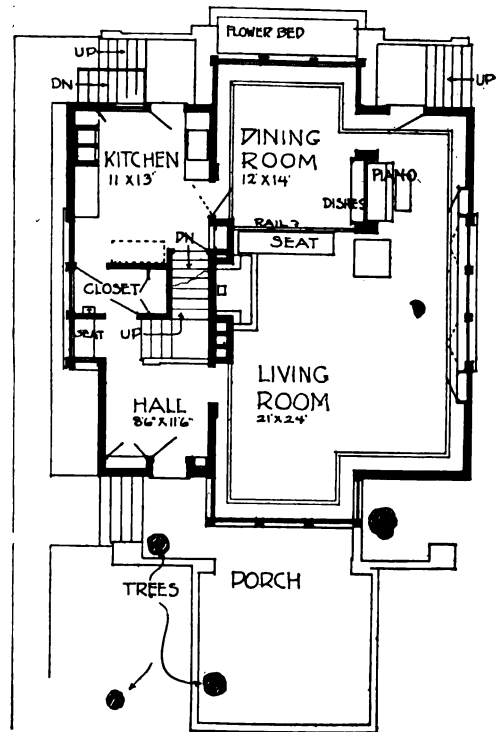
FIRST FLOOR PLAN—OWN HOUSE AT RIVER FOREST, ILL.
